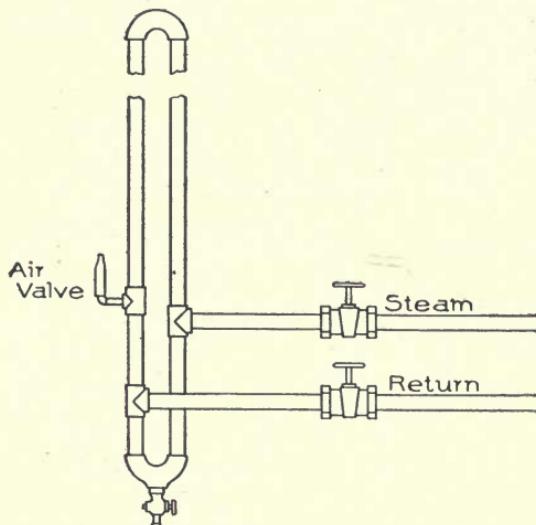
Loop of Steam Pipe to be Run Inside Flue. Connected for Drainage and Air-Venting.
